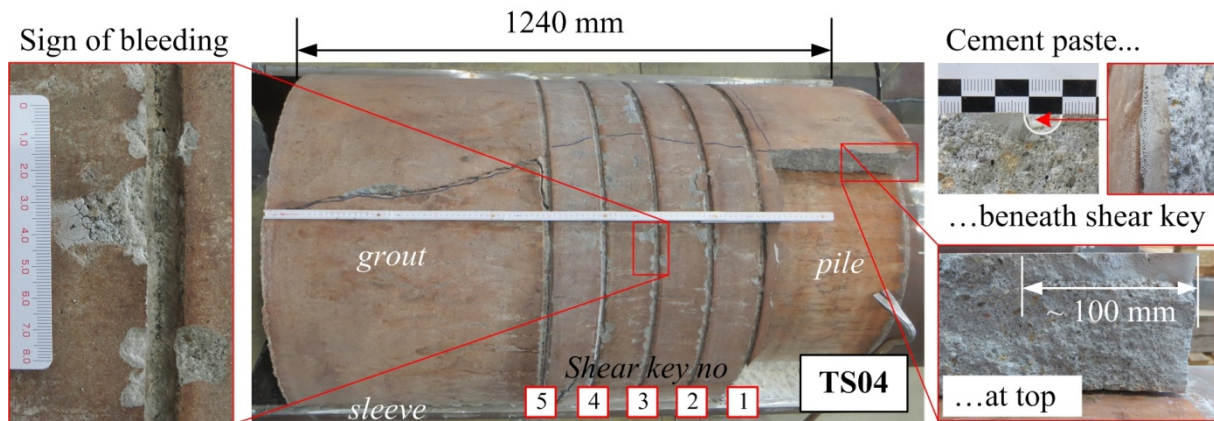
Pile shear key and grout wedge exemplarily at test specimen TS04.
